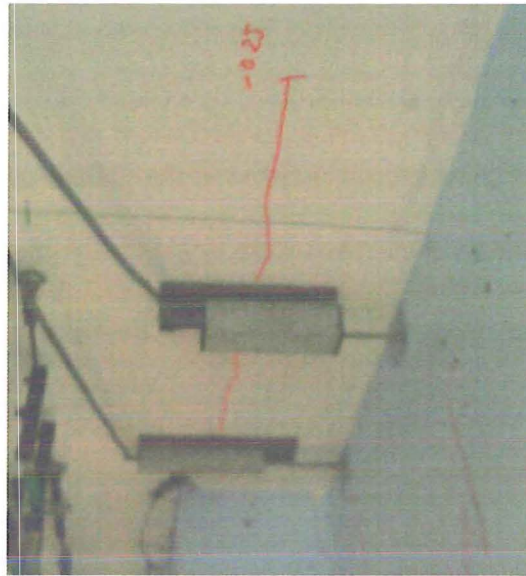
Initial hollow-core crack that formed in the soffit of the first unit.
